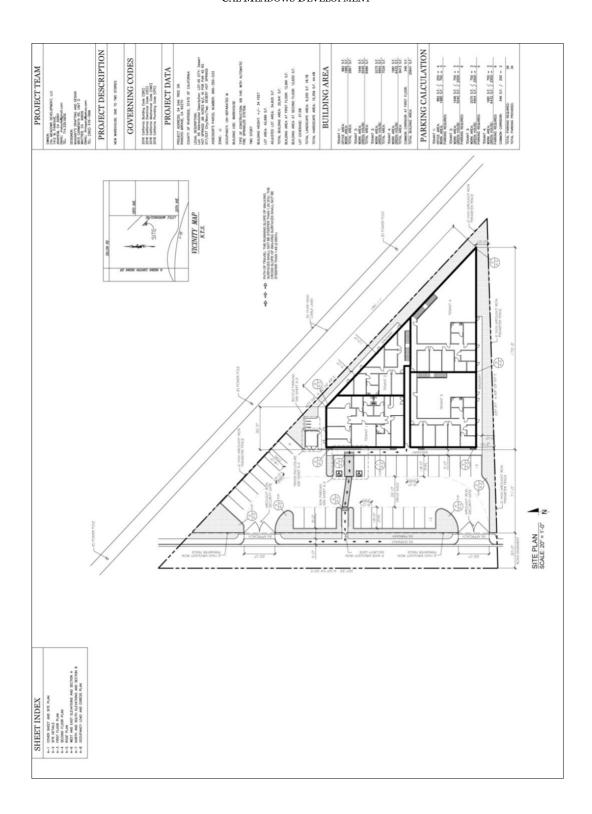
SITE PLAN OF PROJECT SITE
